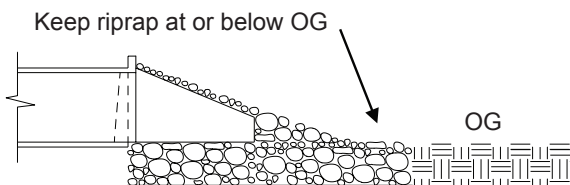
A typical application is shown using riprap for erosion protection at a storm drain outlet.
